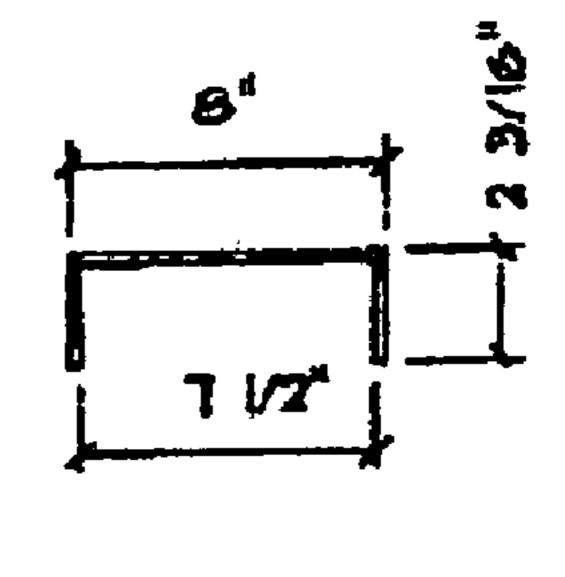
1/4" FLANGE DESIGN TOP PLATE CAP
